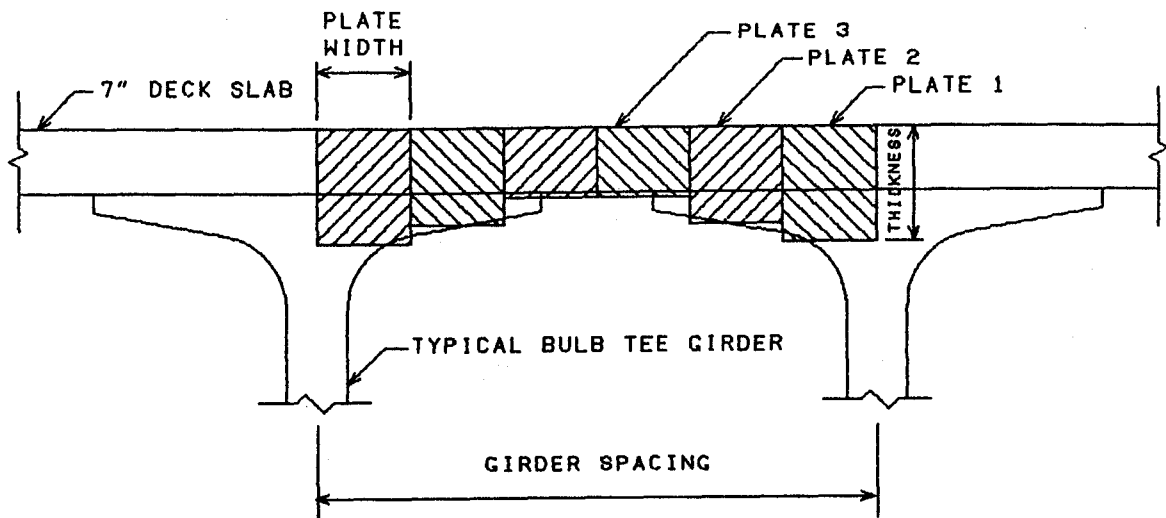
SKETCH SHOWING THICKENED PLATE BENDING ELEMENTS FOR CONCRETE BULB TEE GIRDER FINITE ELEMENT MODEL
